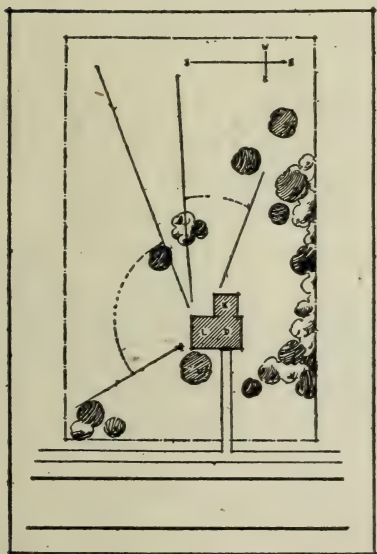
FIG. C — Planting plan to insure best effect of shade, outlook, protection and privacy on a lot facing east
